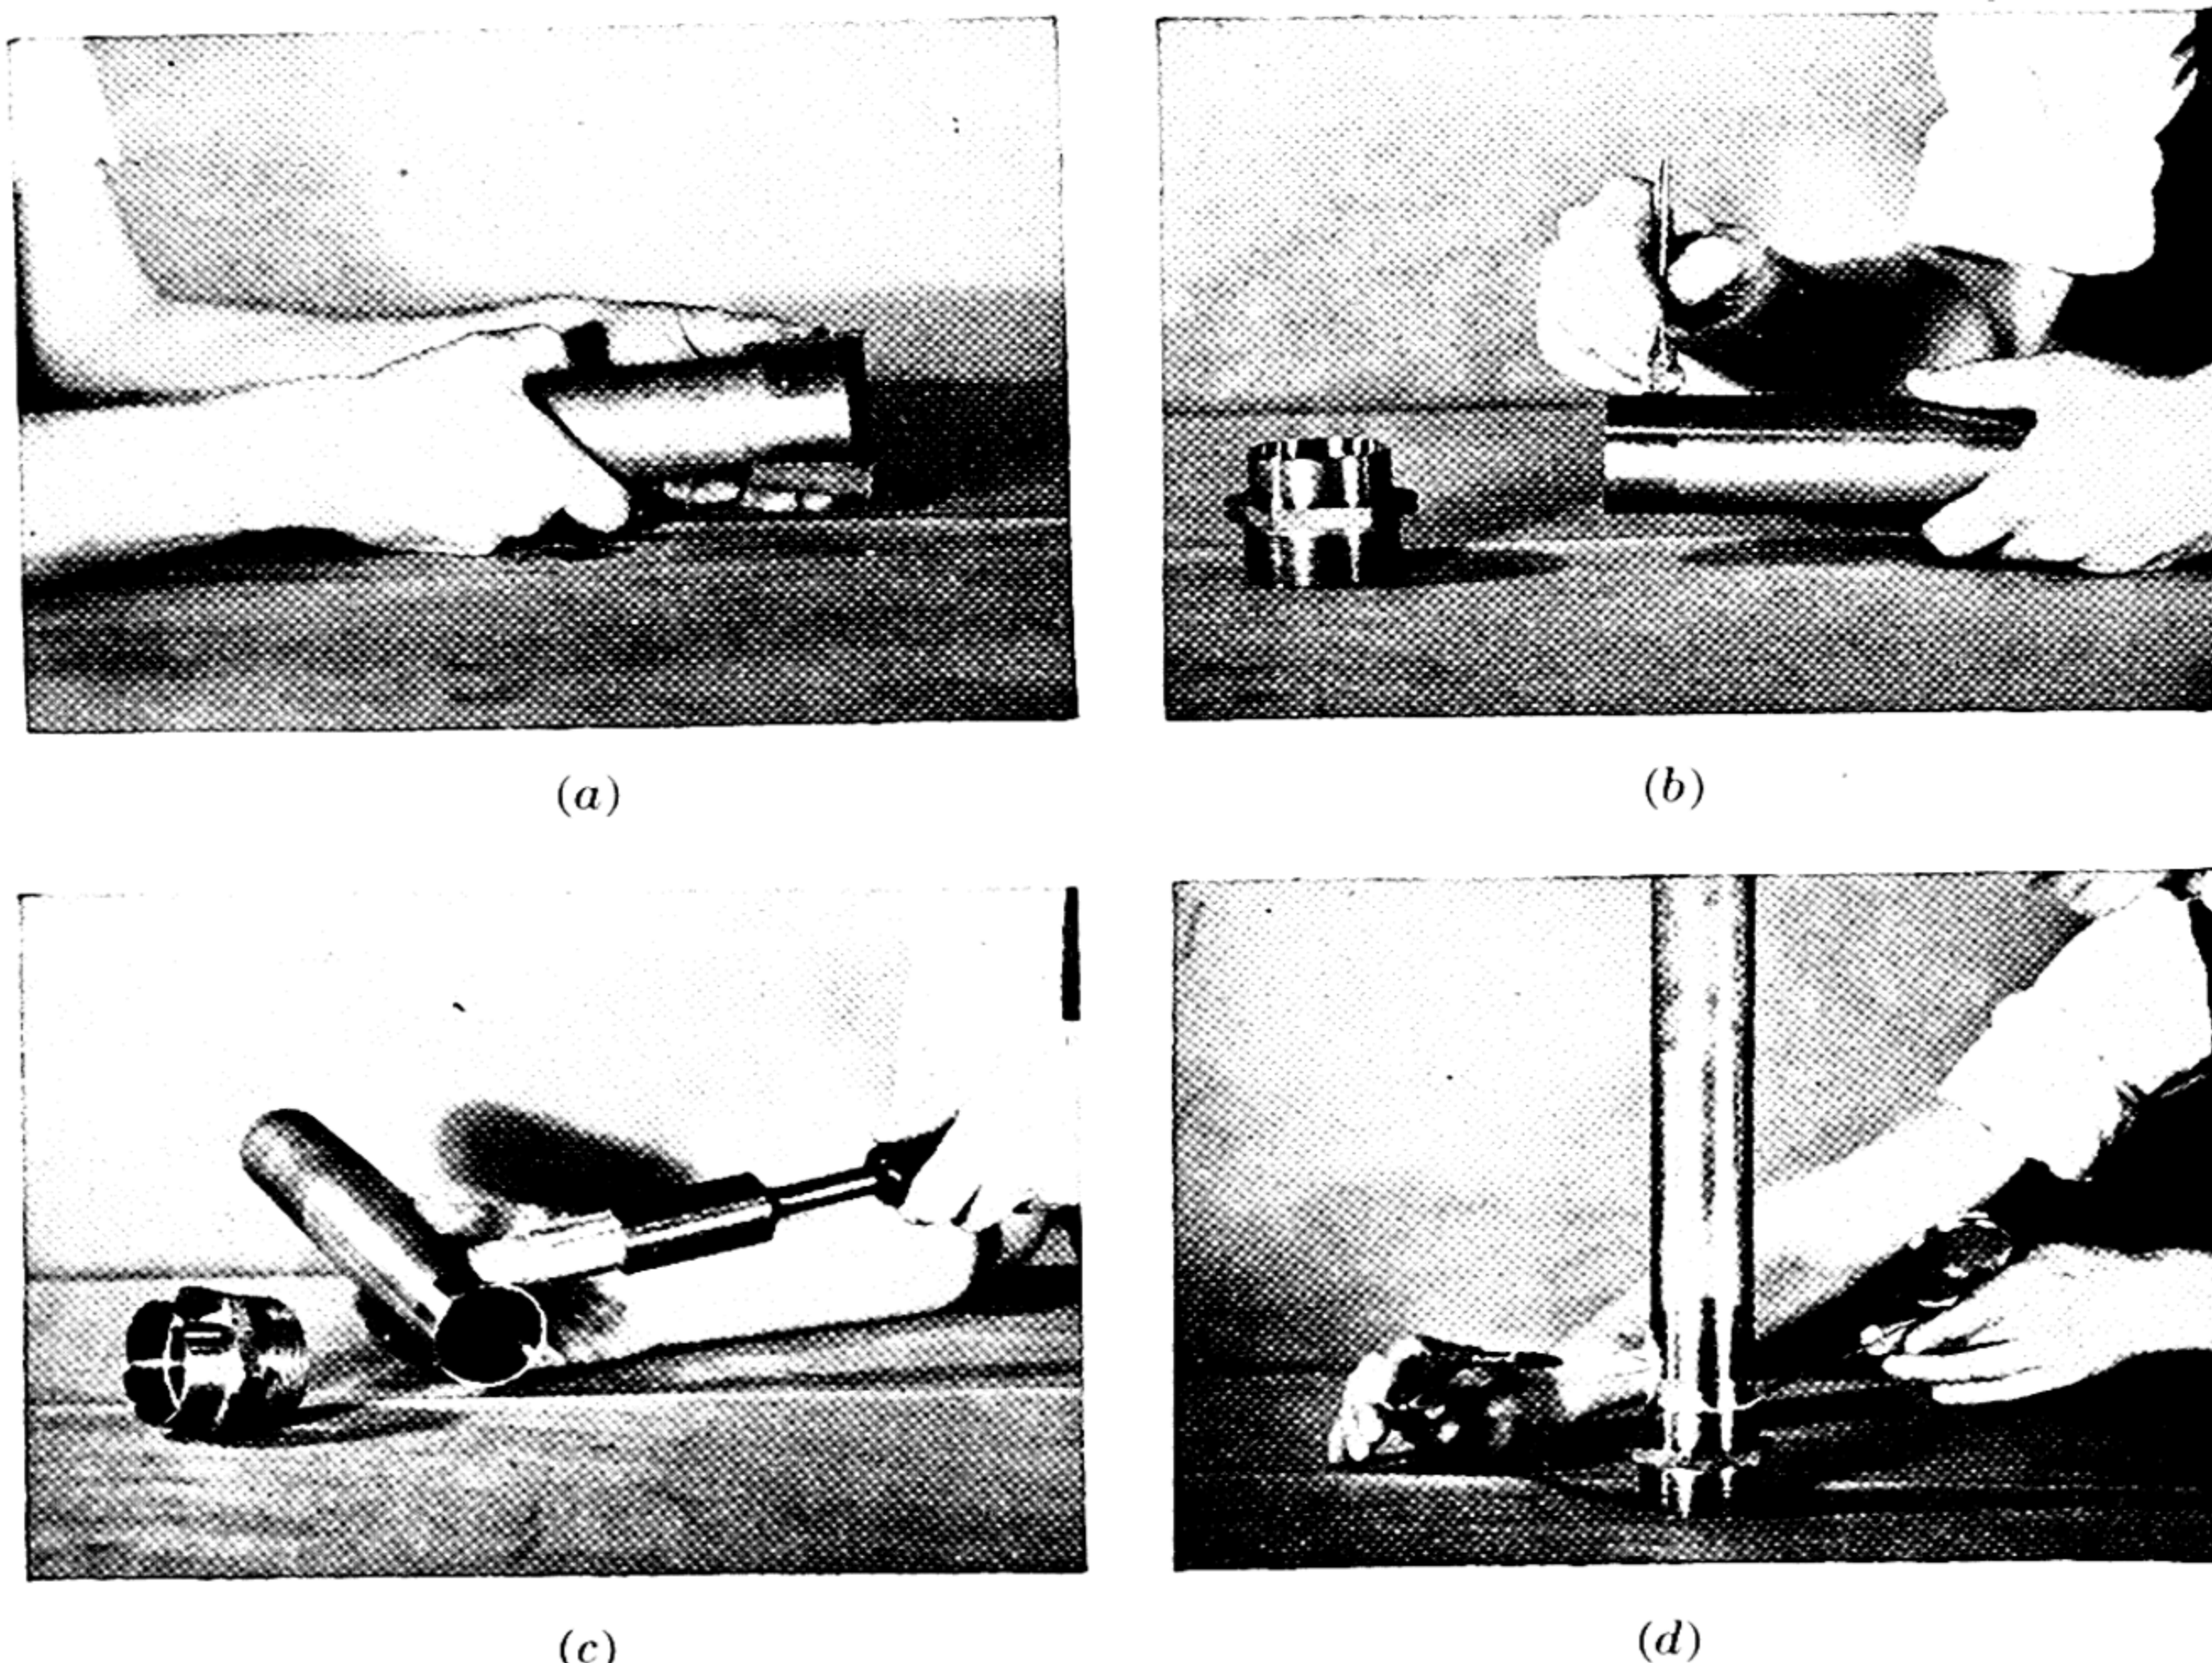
Four Steps in Making a Solder Joint: (a) Cleaning both tube and fitting. (b) Applying flux to tube and fitting. (c) Tinning tube and fitting. (d) Heating and adding solder to fill joint. Courtesy Crane Co.
